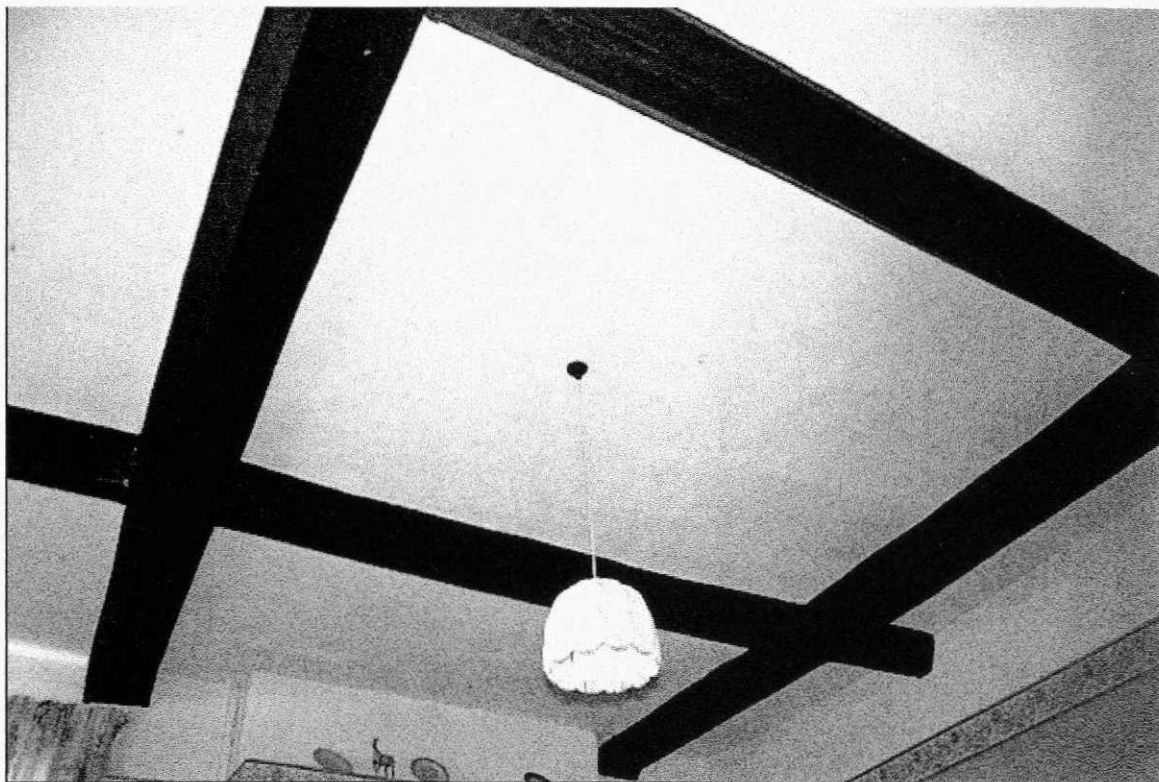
(above): Cross-beam ceiling of first chamber on second floor
